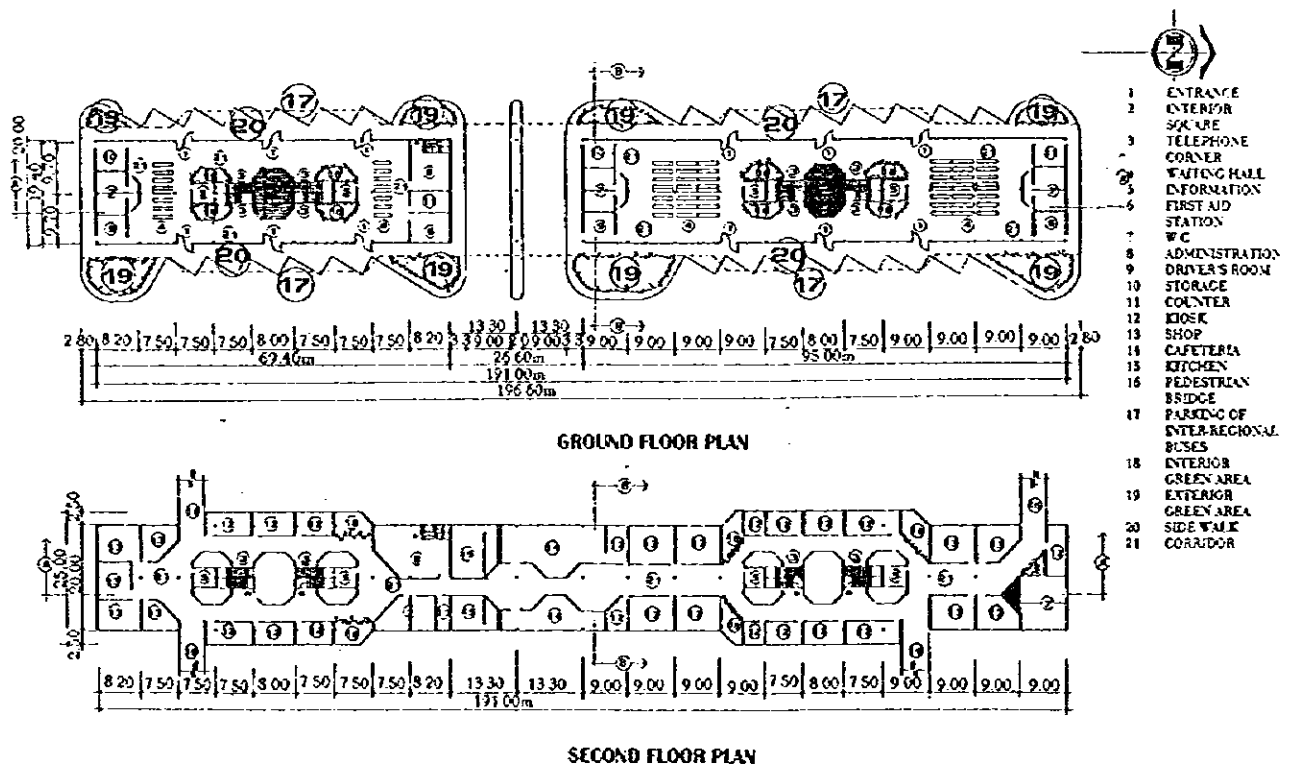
Ground and Second Floor Plan of South Interregional Bus Terminal
